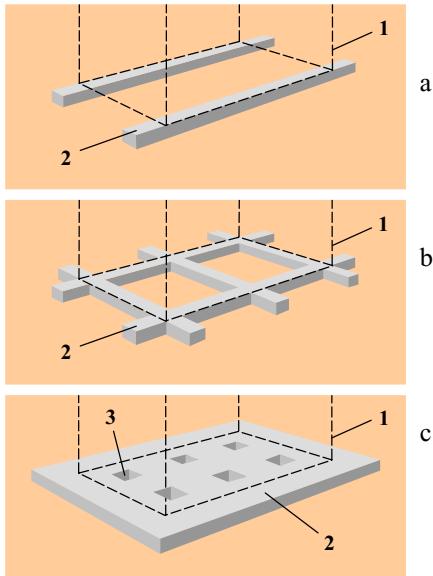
Types of foundations made of monolith steel concrete used in Moscow as constructional antisuffosional protection (schematic). (a) Strips. (b) Crossing strips. (c) Slab
